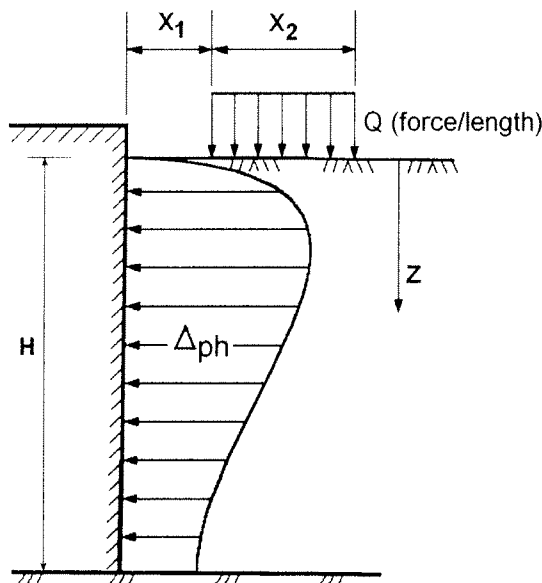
Horizontal Pressure on a Wall Caused by a Finite Line Load Perpendicular to the Wall.
